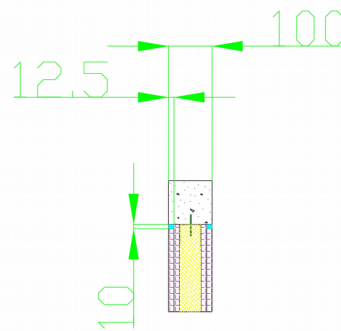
wall gypsum to stone thickness ≥ 100 mm
